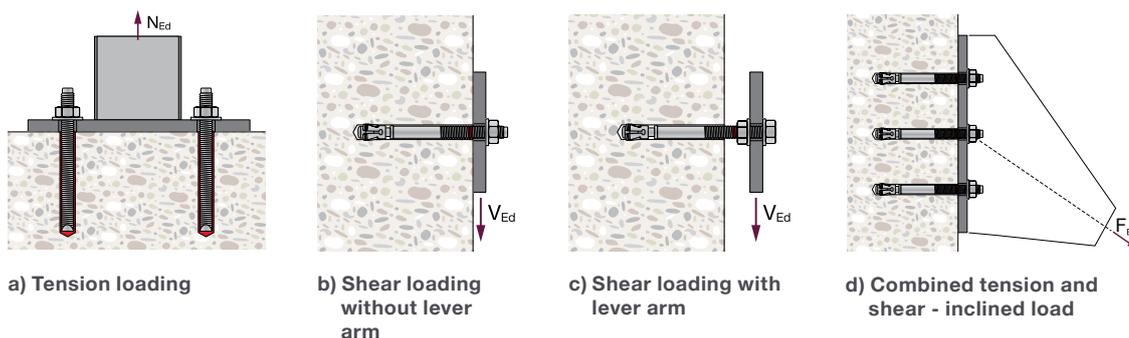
Tension and shear load acting on anchors fastened with attachments to concrete
